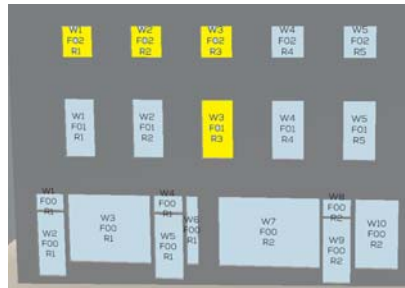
Location of Moderate Ratio Failures on Impact House and 96 to 98 High Street
